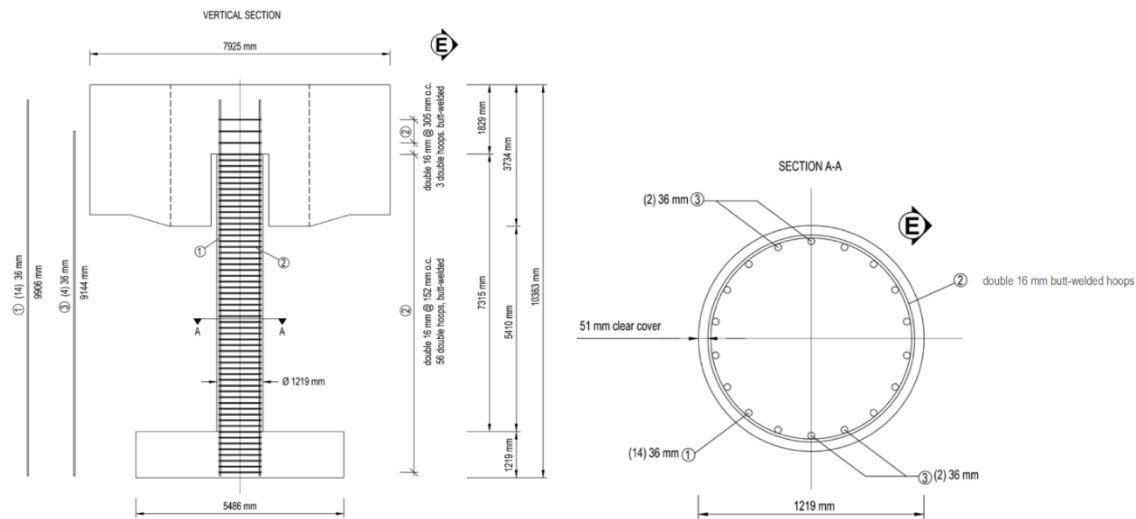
Full-Scale Bridge Column Tested Under Seismic Loading at UC San Diego's Large High-Performance Outdoor Shake Table (Schoettler et. al 2012)
